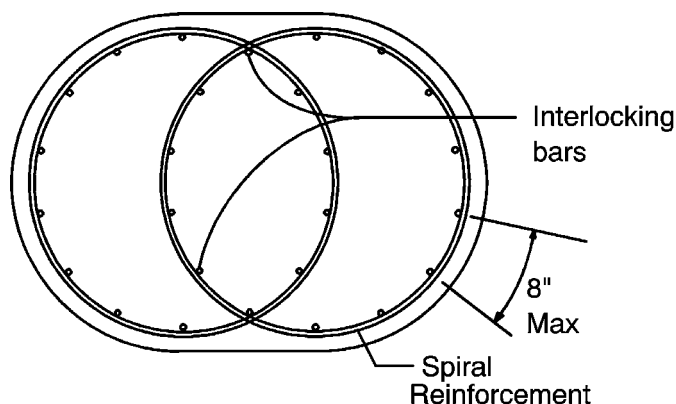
Column Interlocking Spiral Details
